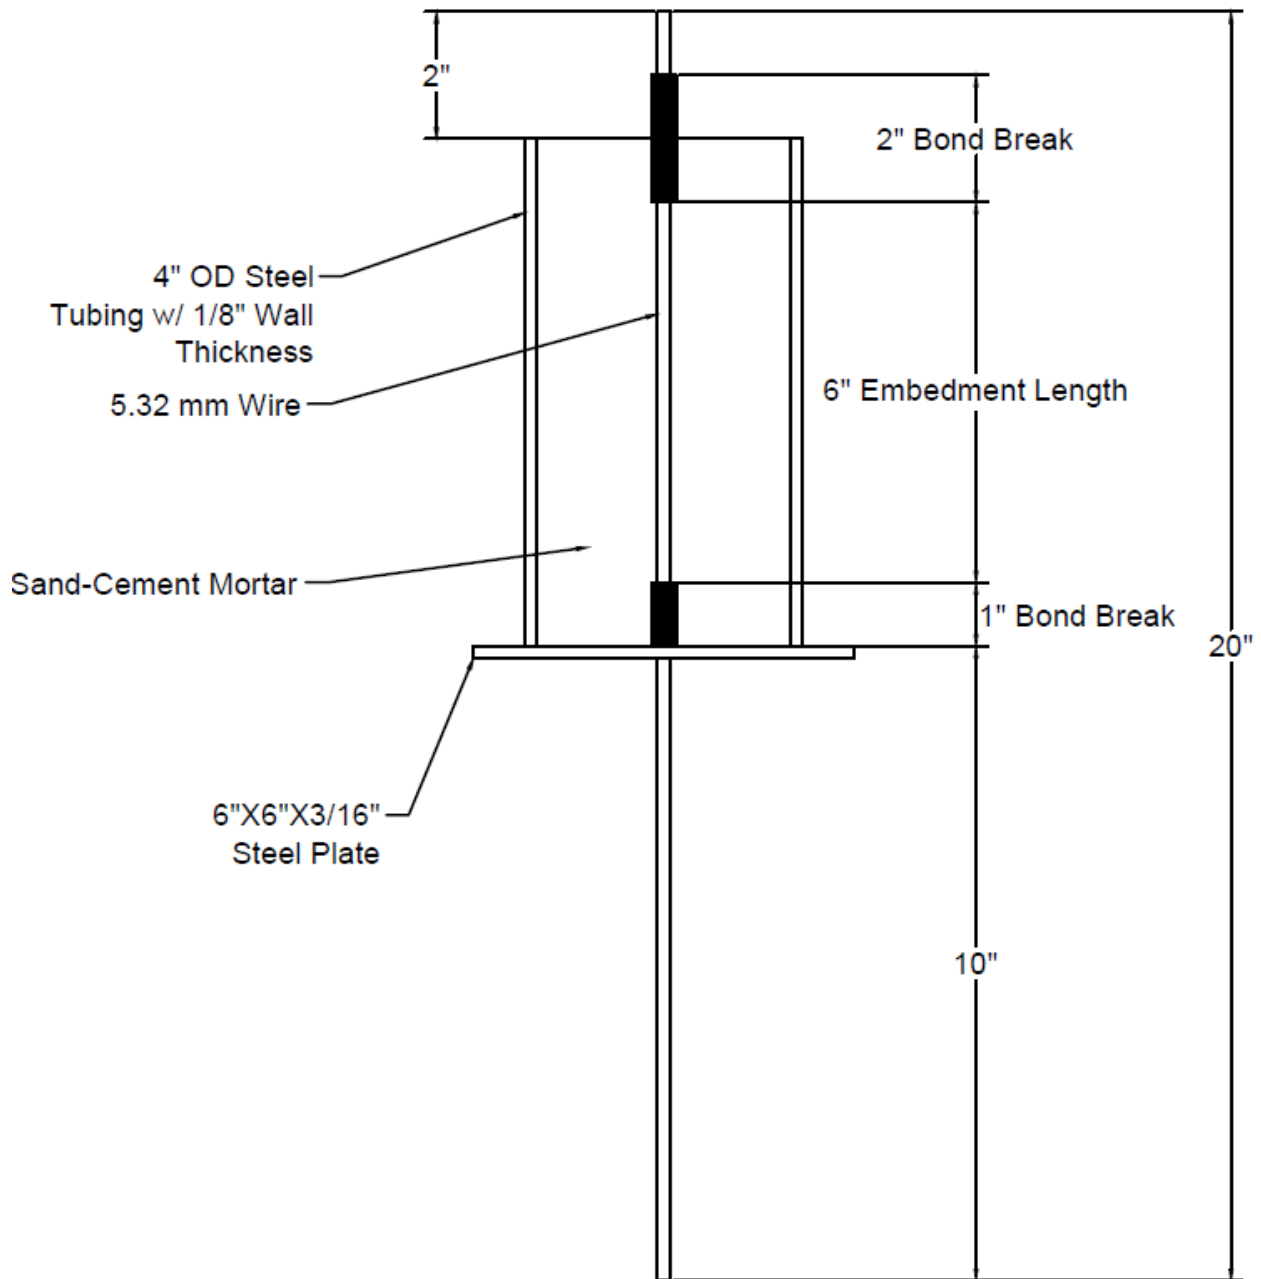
Final dimensions of wire pull out test specimen [after: (Arnold, 2013)]
